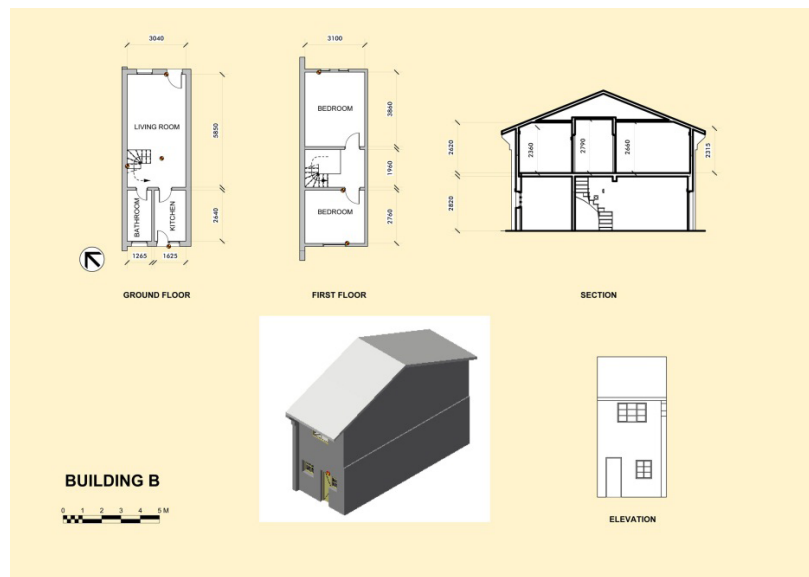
Typical building documentation, showing dimensioned building plans with monitor locations, section, elevation and axonometric view (Peter Phillips)
